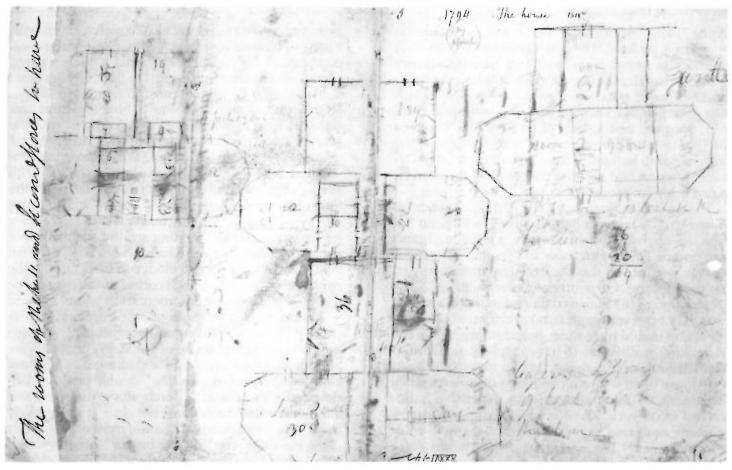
Sketch of preliminary floor plans for Montpelier, 1794(?), Top left to right: second story, first story, garret; Bottom: basement story (Courtesy of Massachusetts Historical Society).
